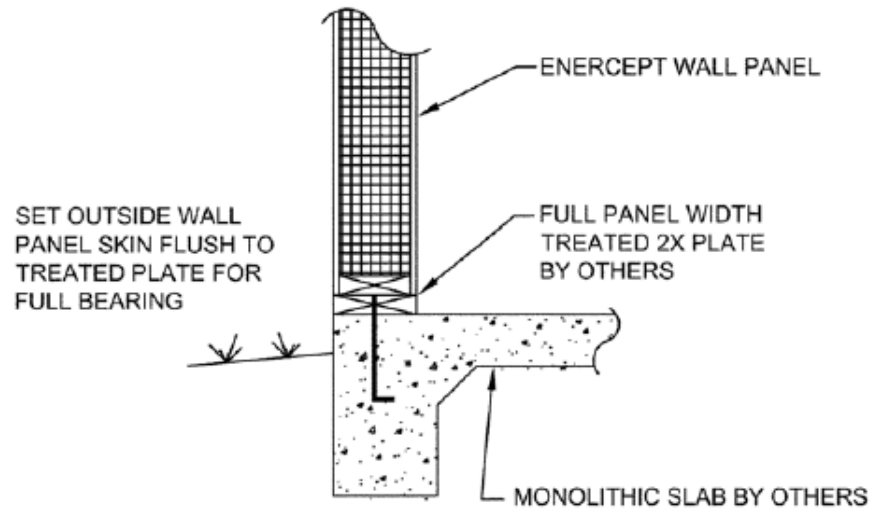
TYPICAL WALL TO MONOLITHIC SLAB
